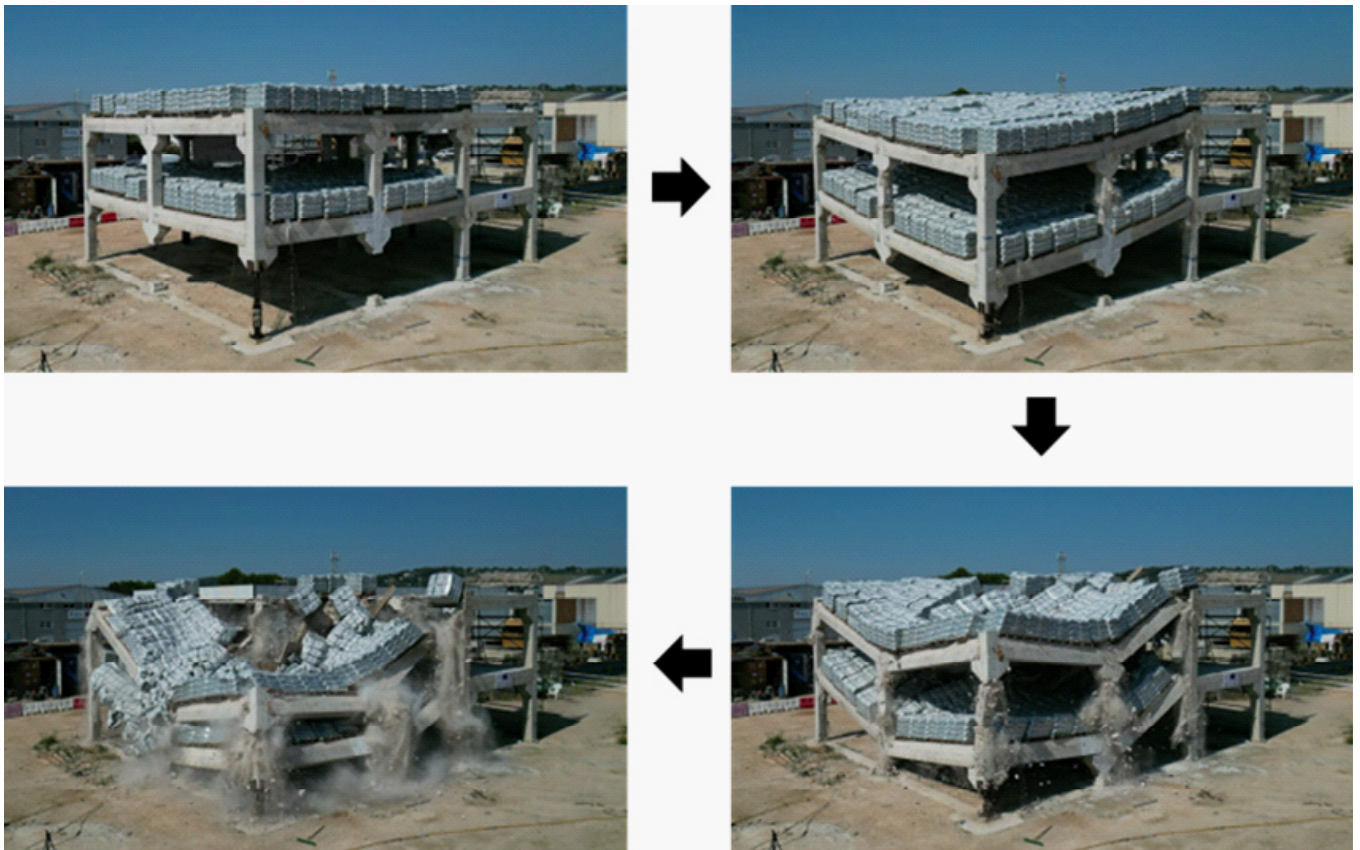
The partial collapse of the precast building specimen during Phase 2.
